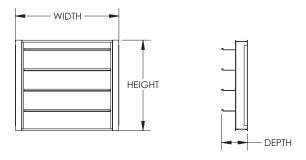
BACKDRAFT DAMPERS FOR EA OUTDOOR UNITS
